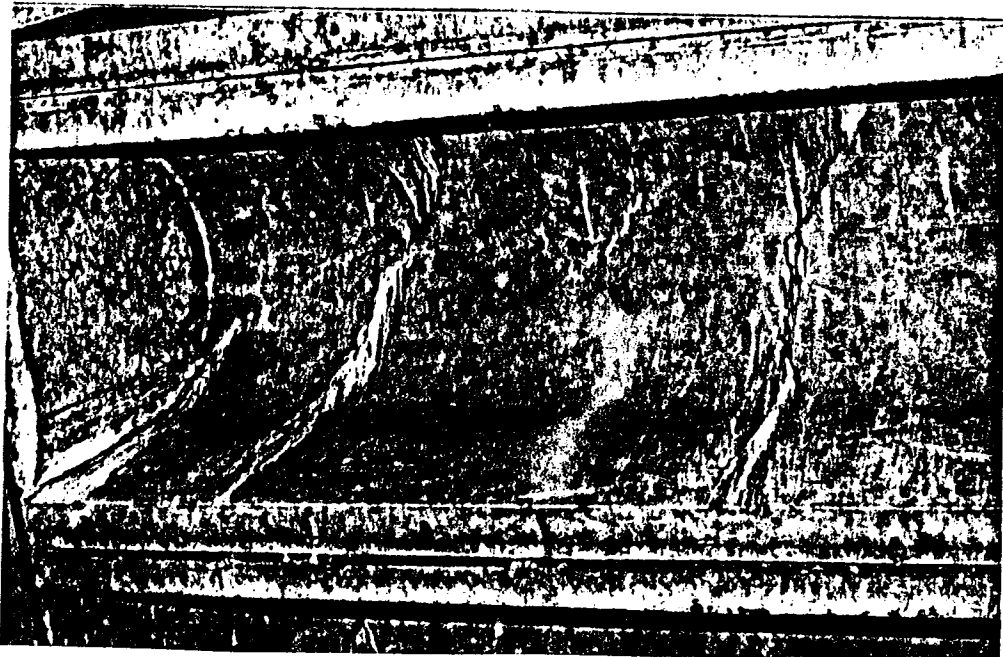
Transverse cracks from bottom of deck - PFT bridge (item 265).
